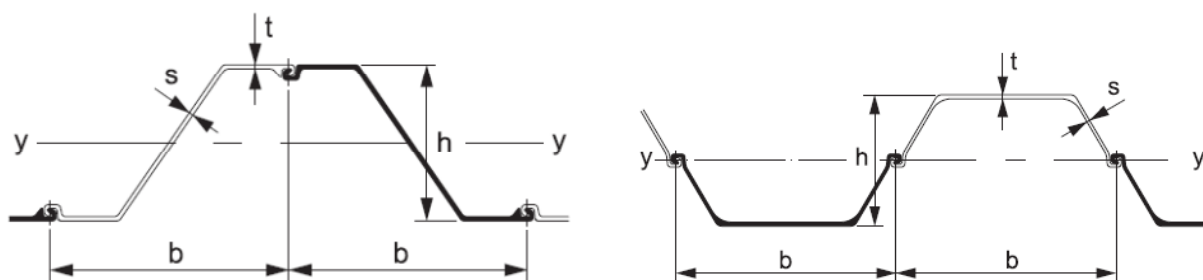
AZ type double sheet pile (left); U type double sheet pile (right)
